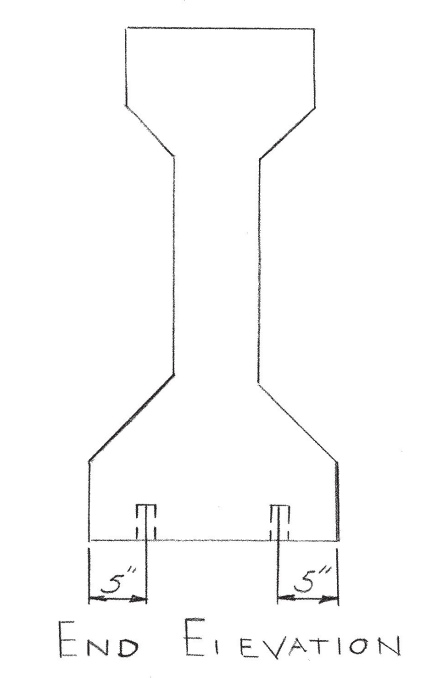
DETAILS SHOWING BEAM CONNECTION Typical at Bents
